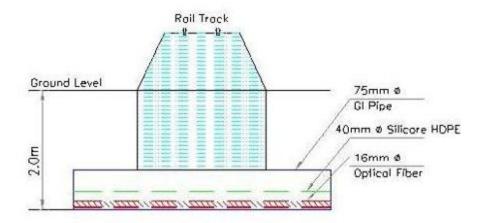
Details of a railway/roadway crossing using horizontal directional drilling (HDD) method.
